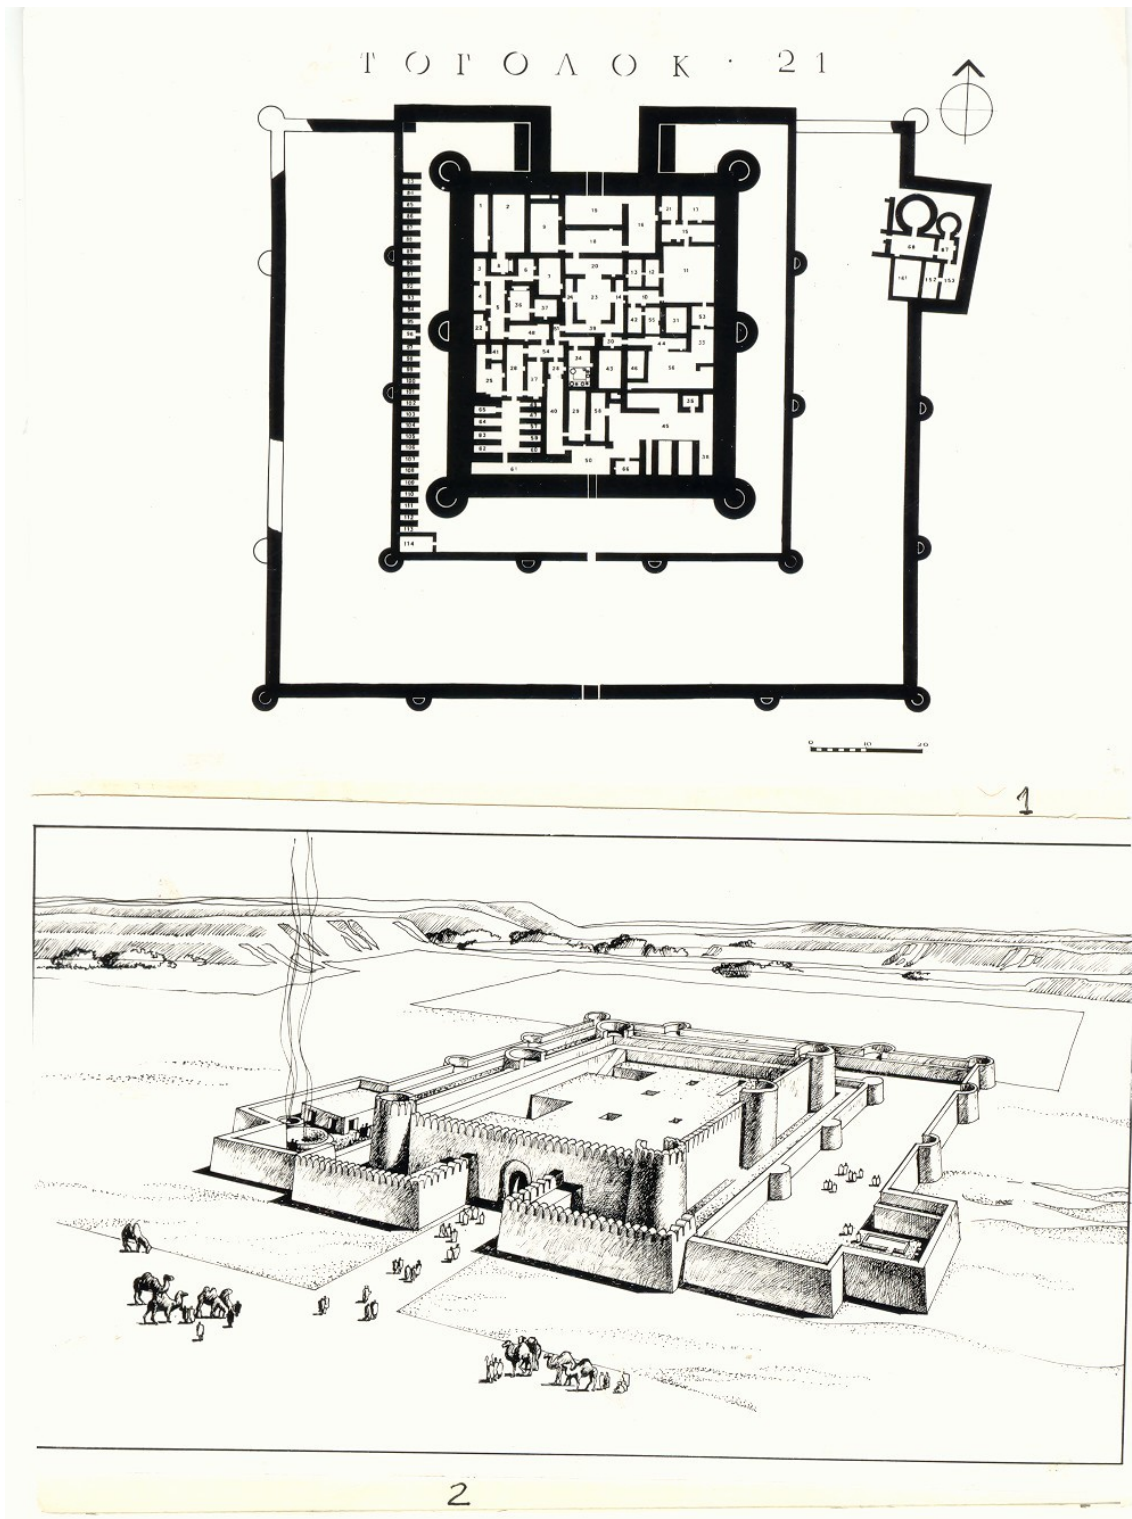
Temple of Togolok-21. Plan (No.1) and Reconstruction (No.2).
